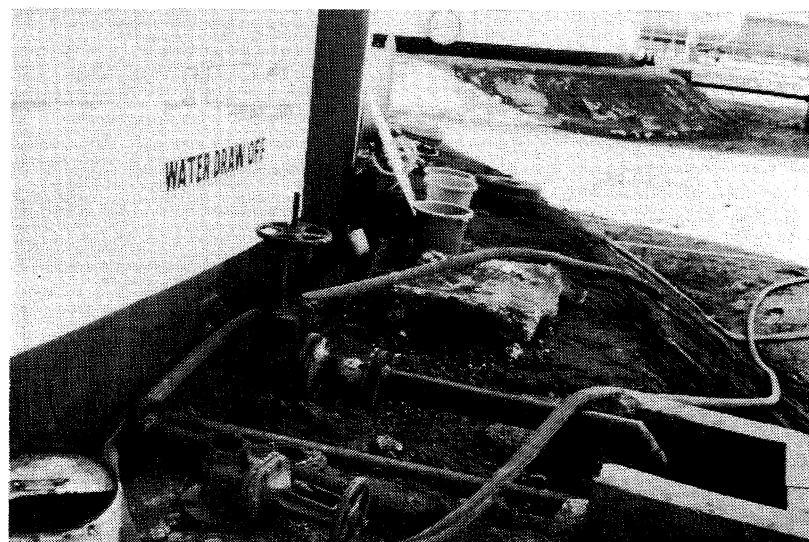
San Fernando Port - Oil Storage Facility. Storage tank settlement caused drainage valve to break because the outlet pipe was restrained by the concrete sump wall. Note the broken valve in the foreground
